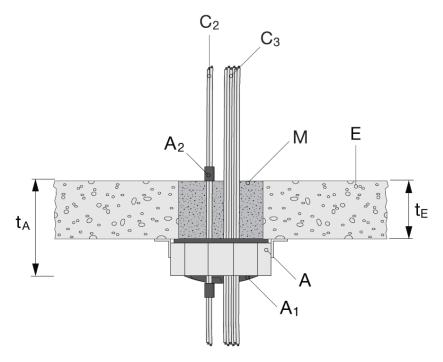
Details of filler (A₁) and cable collars (A) on underside of floor only, $t_E \ge 150 \text{ mm}$
